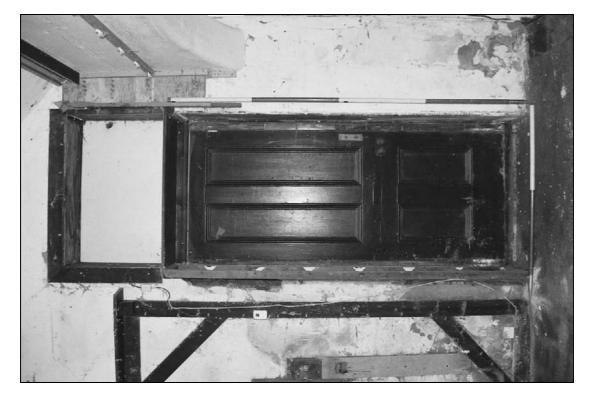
View of void beneath floor of room G2, west alcove of north wall, west range (film D.1)
